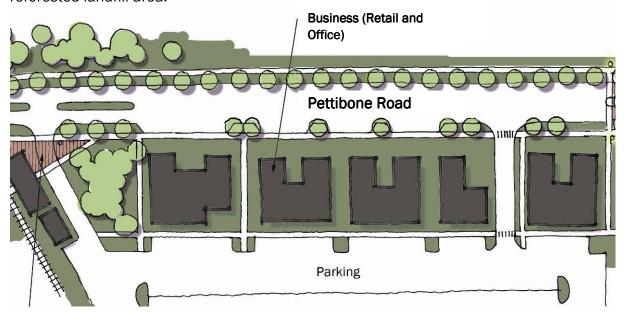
Once the south side of Pettibone Road west of the Train Depot is built-out, development east of the railroad would further enhance the Town Center.
